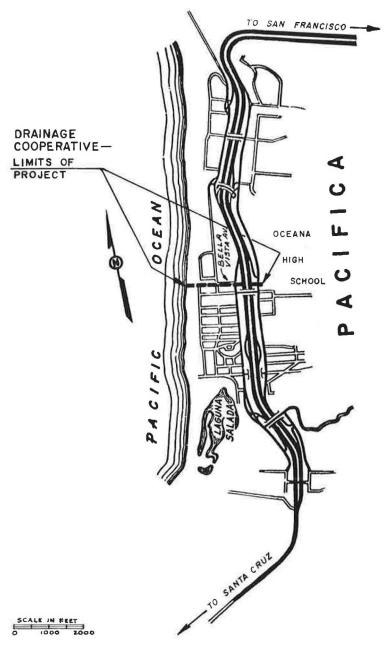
Bella Vista Avenue Drainage Outfall, City of Pacifica, San Mateo County, Calif.
